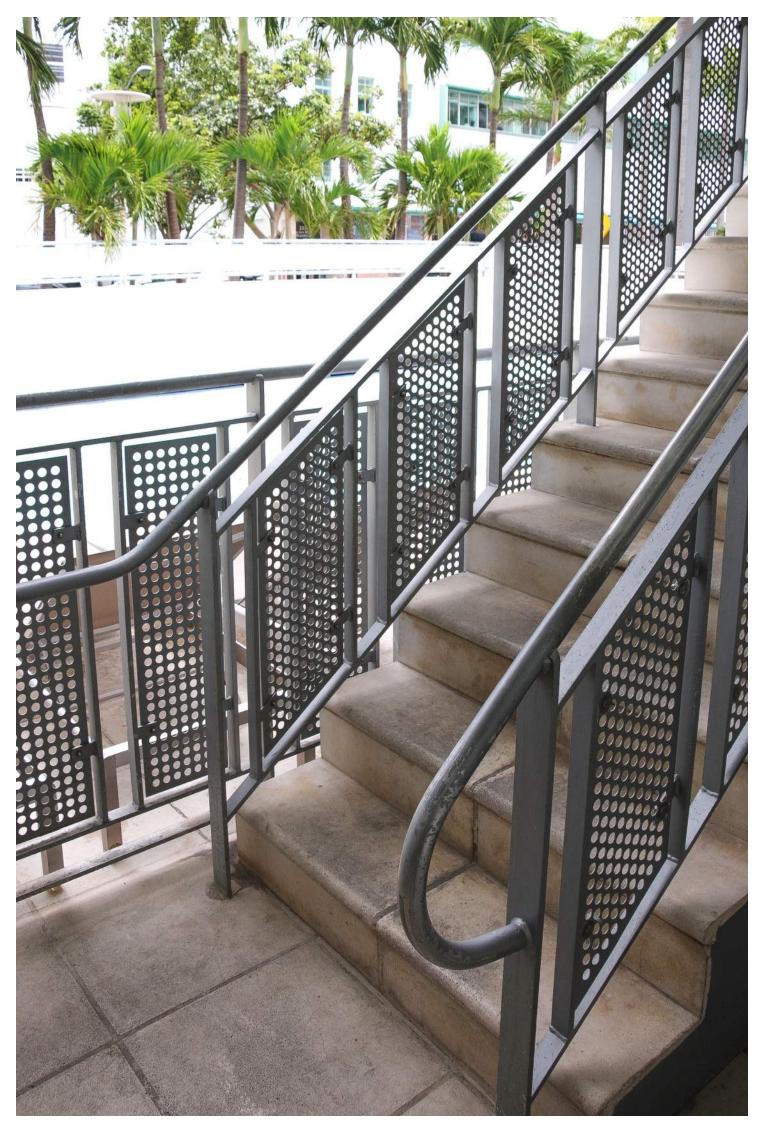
DETAIL VIEW AT RAILINGS @ 1666 JAMES AVENUE
